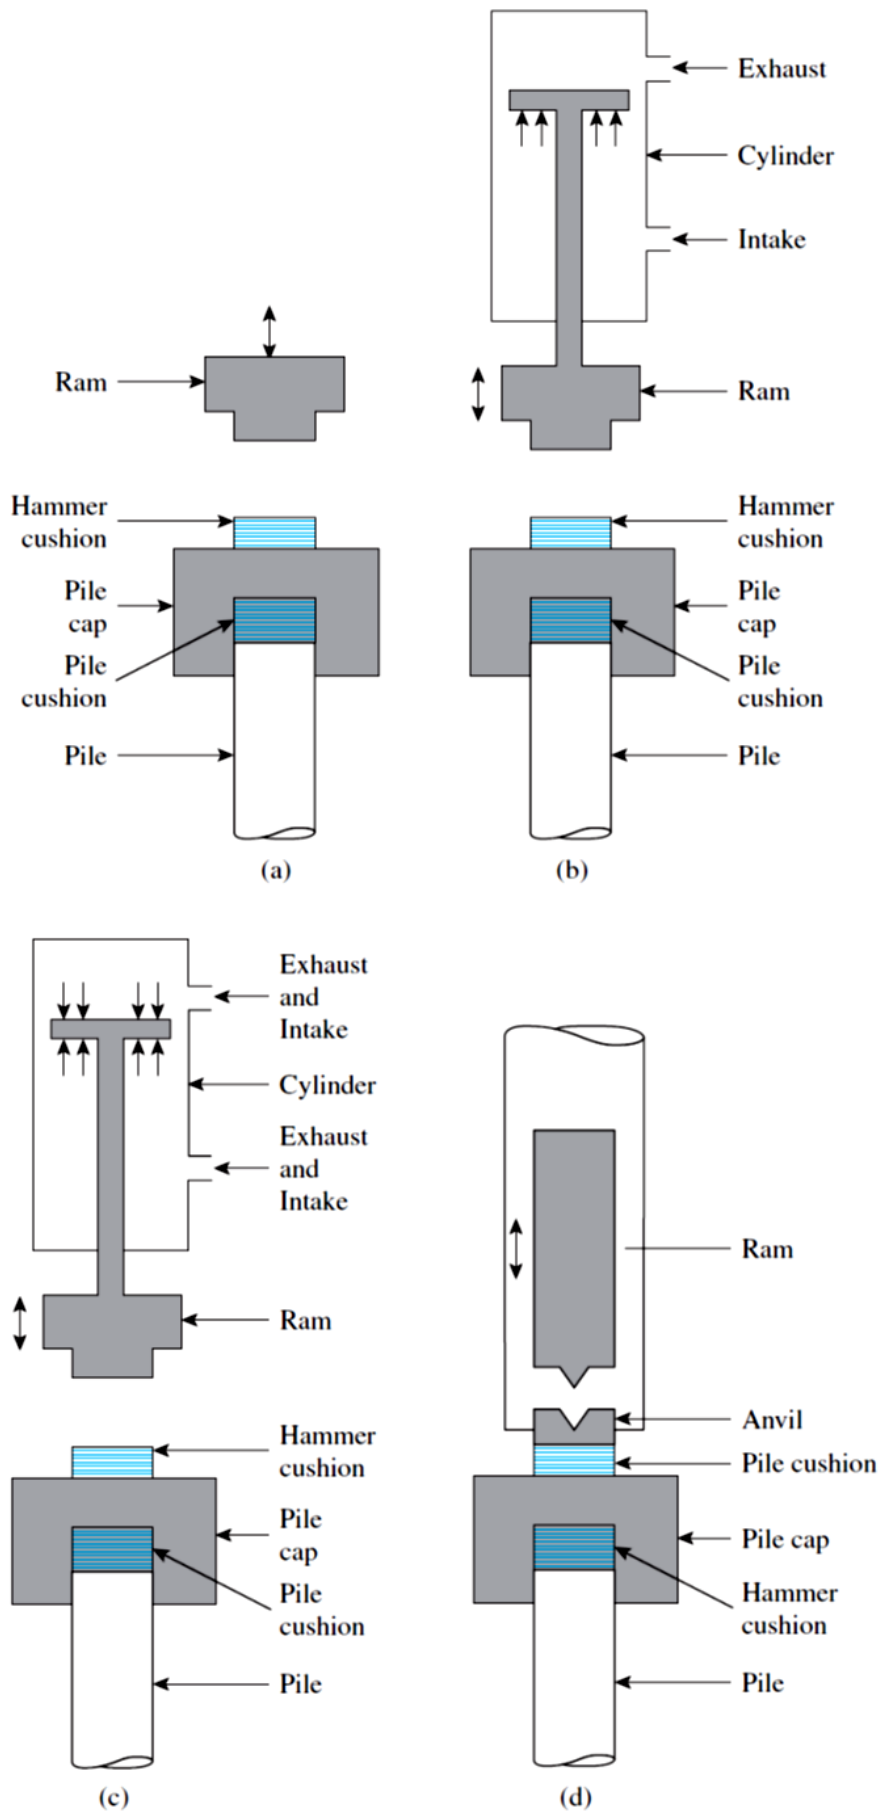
Pile-driving equipment: (a) drop hammer; (b) single-acting air or steam hammer; (c) double-acting and differential air or steam hammer; (d) diesel hammer
